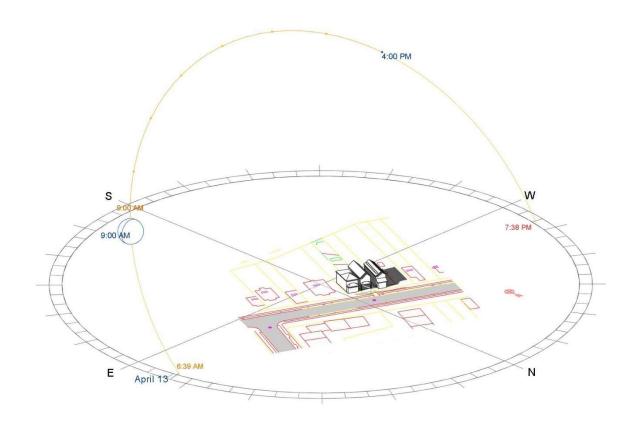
SHADOW LOCATION AT 9:00AM (APRIL 13, 2023) IN CLOSE UP VIEW OF THE BUILDINGS SHOWING THAT THE PROPOSED DWELLING WITH NOT OVERSHADOW THE SOLAR PANELS
